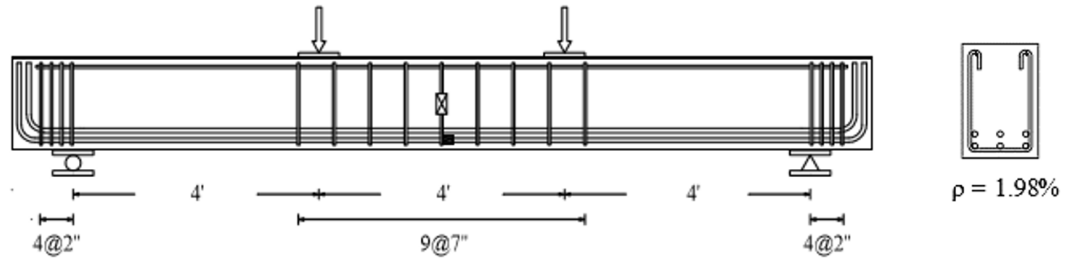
Load pattern, rebar detail, cross section and location of instrumentation
